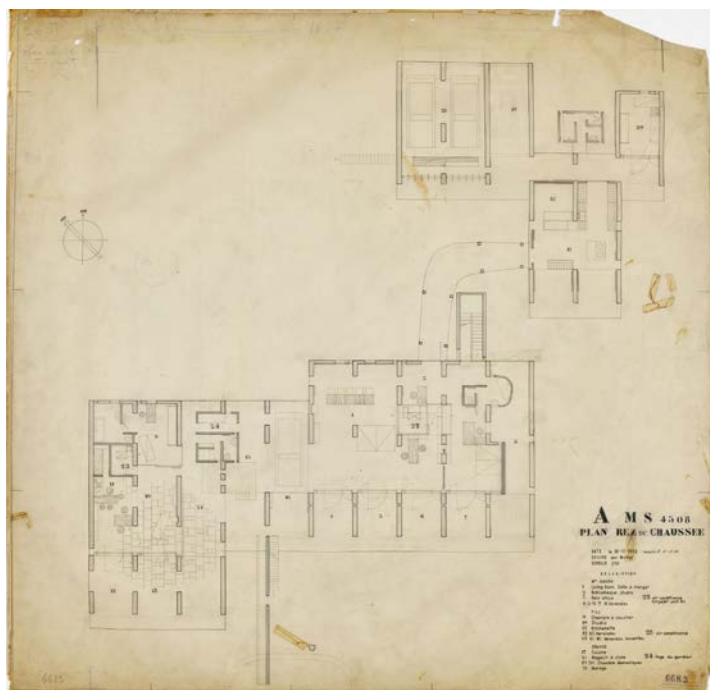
Floor plan with indication for interior furniture, 1952, November 10 (FLC 6683). (© Fondation Le Corbusier / SIAE)
